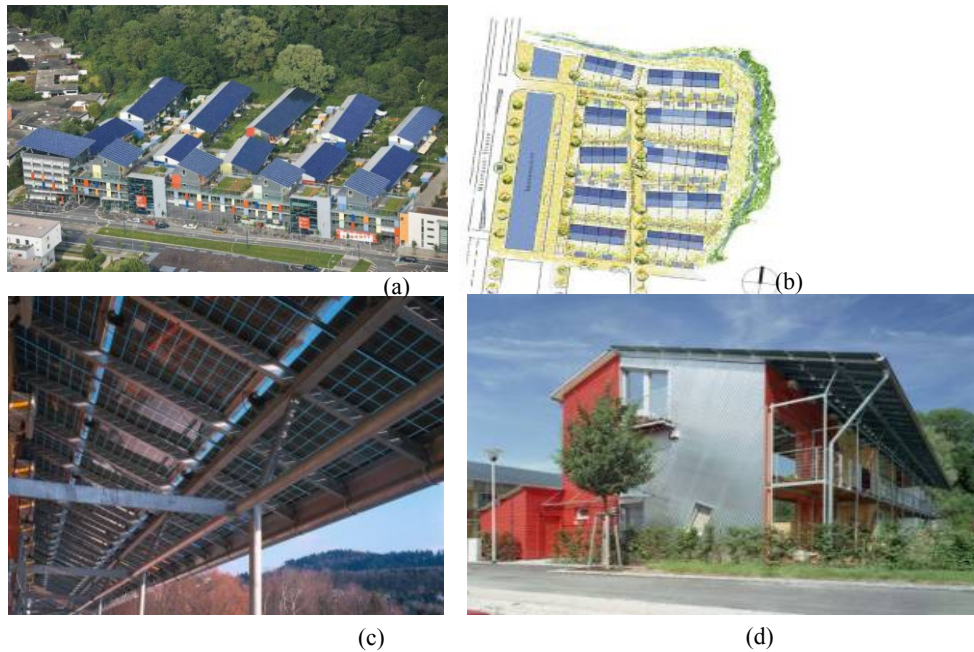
, Solarsiedlung am Schlierberg, Freiburg (Breisgau) (a) view of multi-story buildings and terrace houses, of Mixed-function development, (b) plan view, (c) detail of the overhang of a terrace house, (d) terrace house (Hagemann, 2007).
